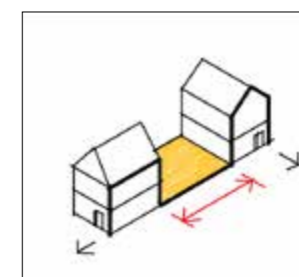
Side gable elevations opposing rear elevations require a minimum back-to-side distance of 11 metres
